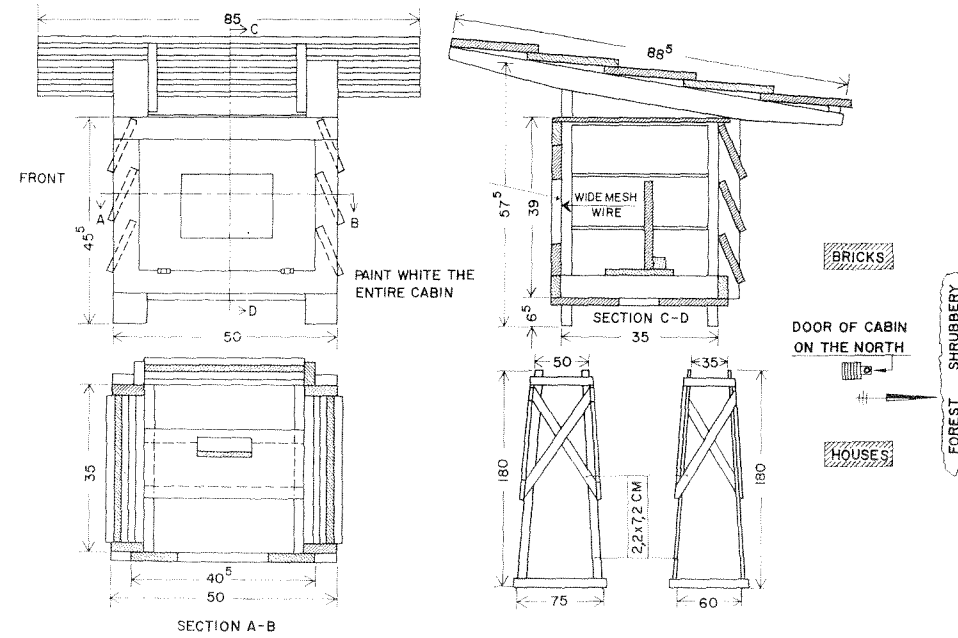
Thermometer cabin. The cabin should be kept as far as possible from houses, bricks, sand, gravel, sheds, forest etc., and if practicable be placed on a lawn or on earth as a brick or stone floor may cause excessive radiation. The location should further be so that wind may give a good ventilation.
